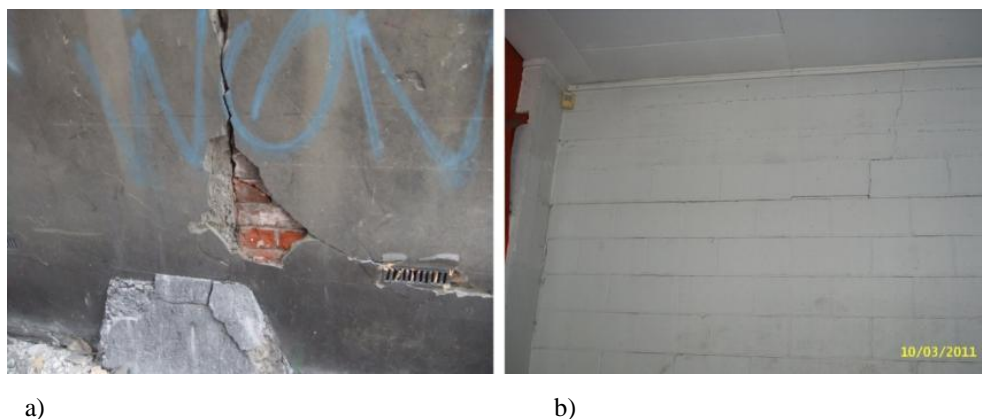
Observed damage on masonry infills after the 22nd February 2011 Christchurch earthquake: a) Corner crushing, b) Stepped cracks
